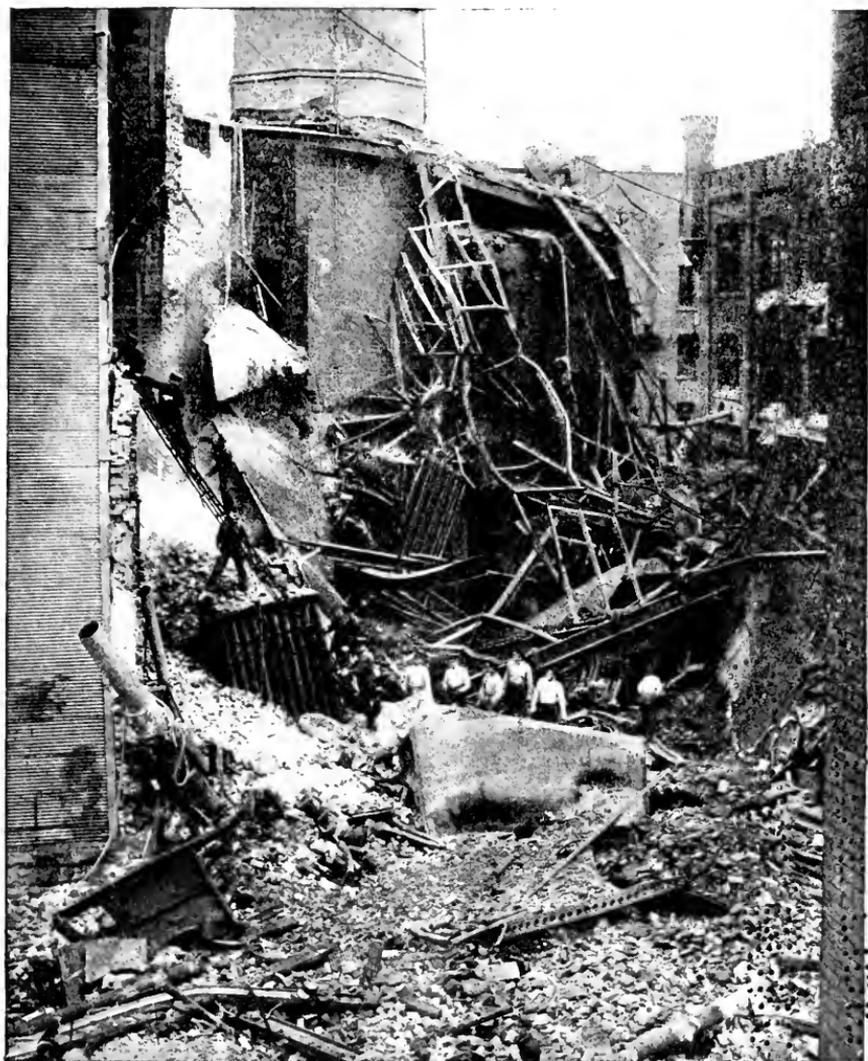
MILWAUKEE BOILER EXPLOSION: GENERAL VIEW OF THE WRECKAGE
